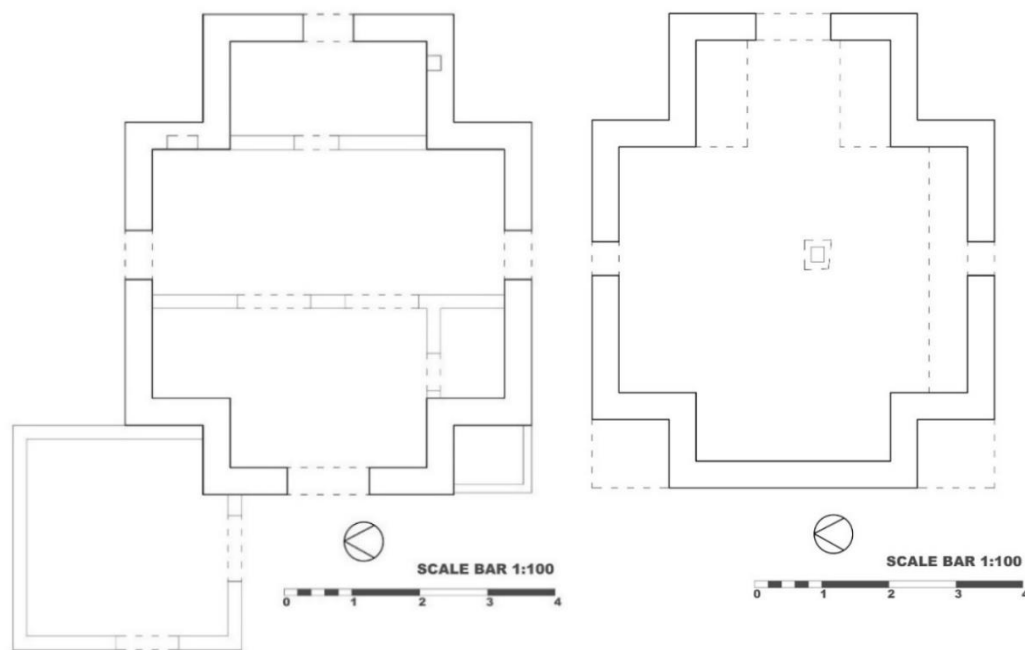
Tirilye, Cemetery Chapel, ground floor plan (left); basement floor plan (right) (2022)
